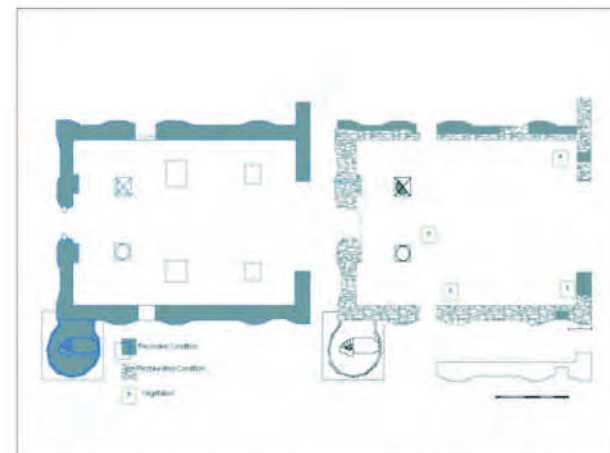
Planimetric plan of the west end of the Cathedral. The original record is shown on the left and the consolidated remains in 2008 on the right. Drawn by Arch. B. Keka.
